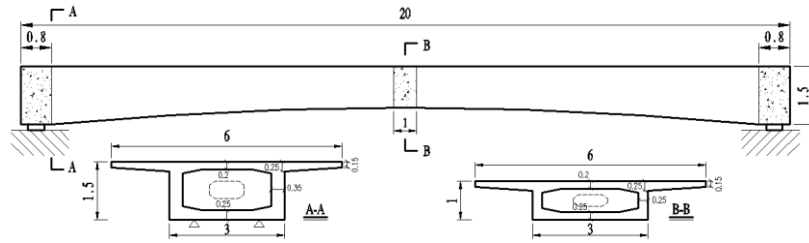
The general layout of the pedestrian bridge (Unit: m)
